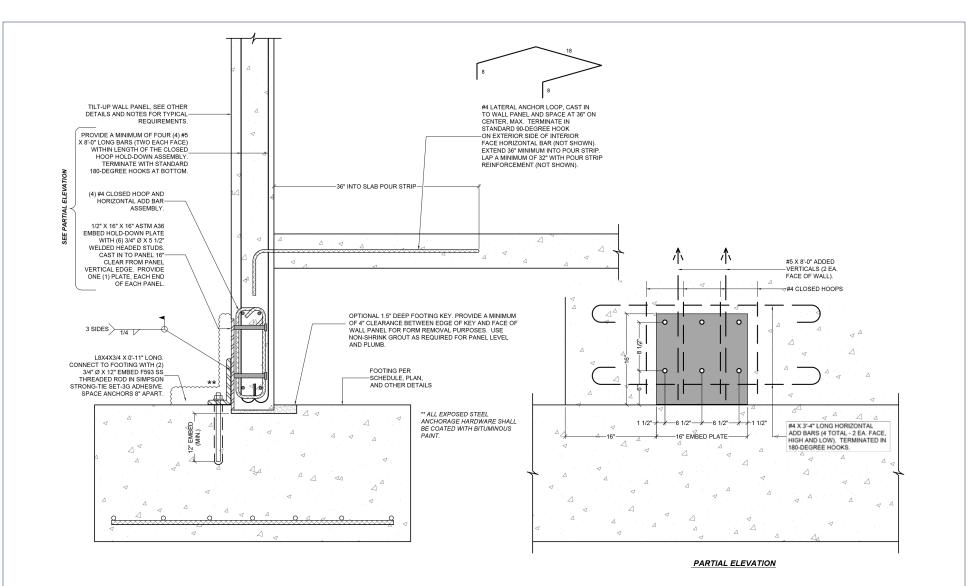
Engineer's typical detail showing wall panel base anchorage to the foundation level and to the slab. It is important to note that not all wall panels require physical anchorage to the foundation. Generally, foundation connection is limited to those panels that are subjected to overturning forces not capable of being resisted by the weight of the panel itself.
